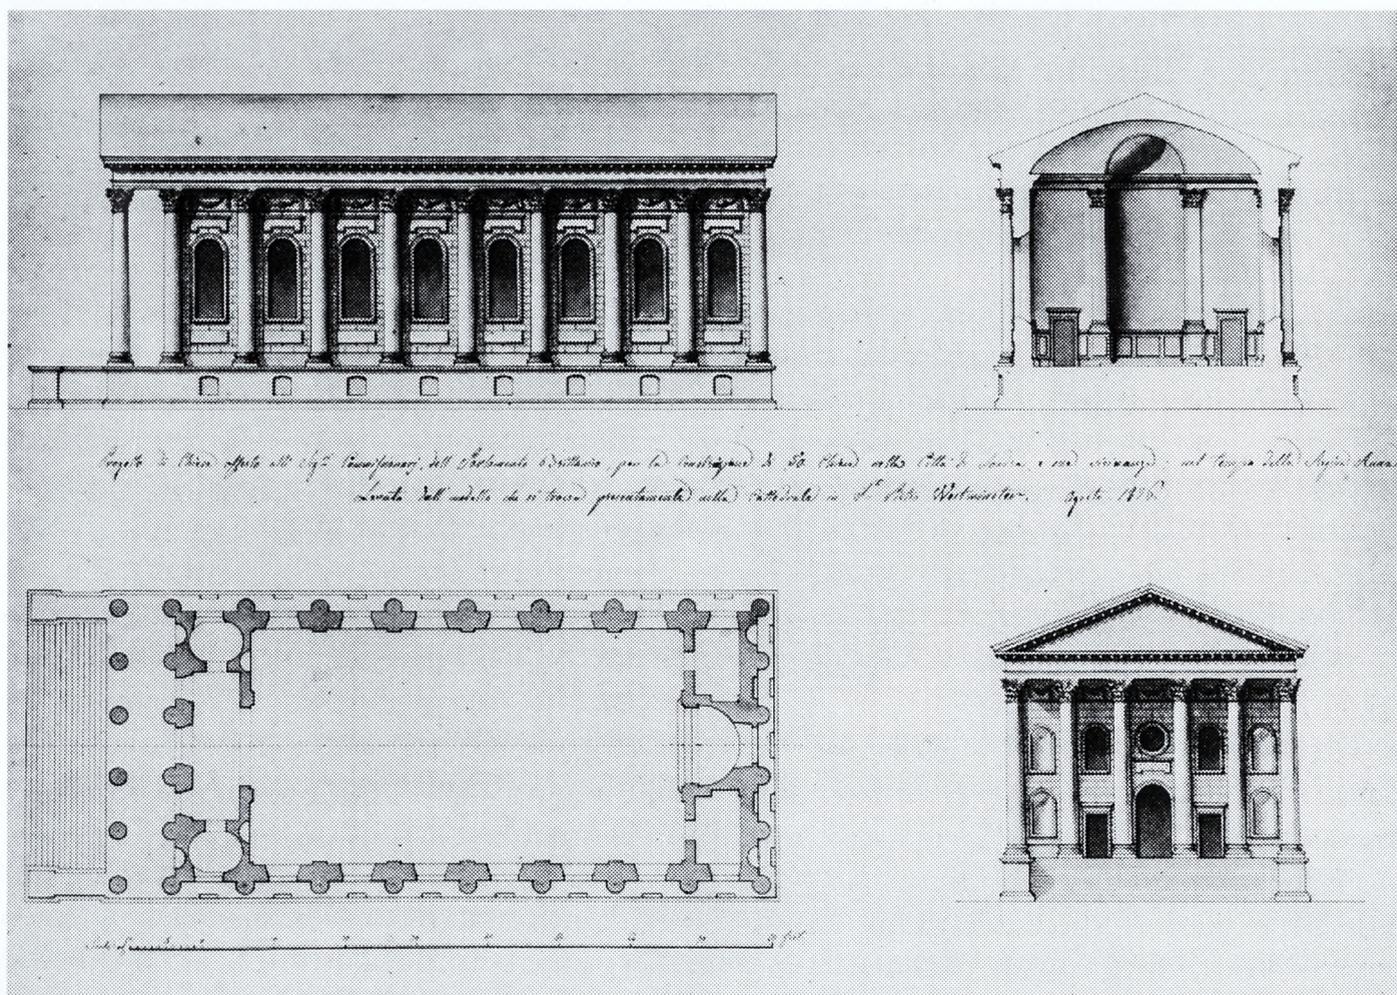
Plan, section and elevations of one of the models by Gibbs, drawn by C. R. Cockerell, 1826.
